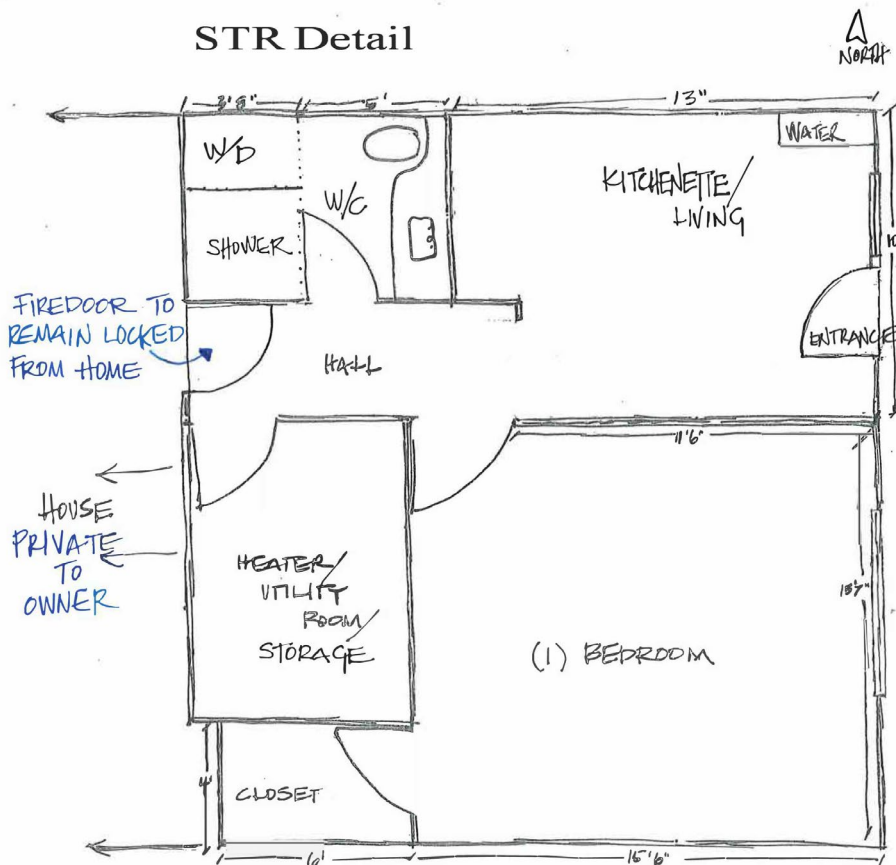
shows the basement floorplan for the proposed STR at 1414 Maple Drive
